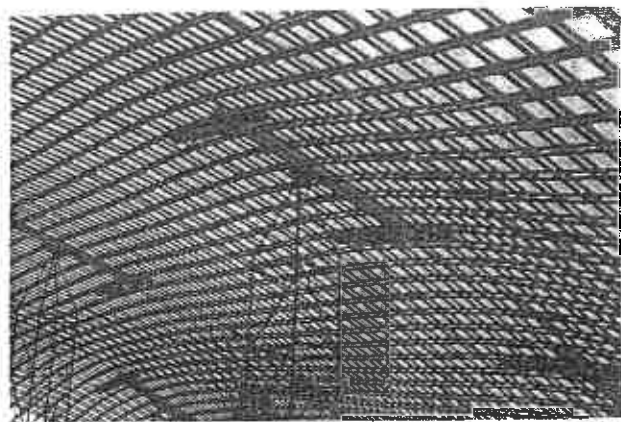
Detail of spreader and ball joint at top of scaffolding towers
